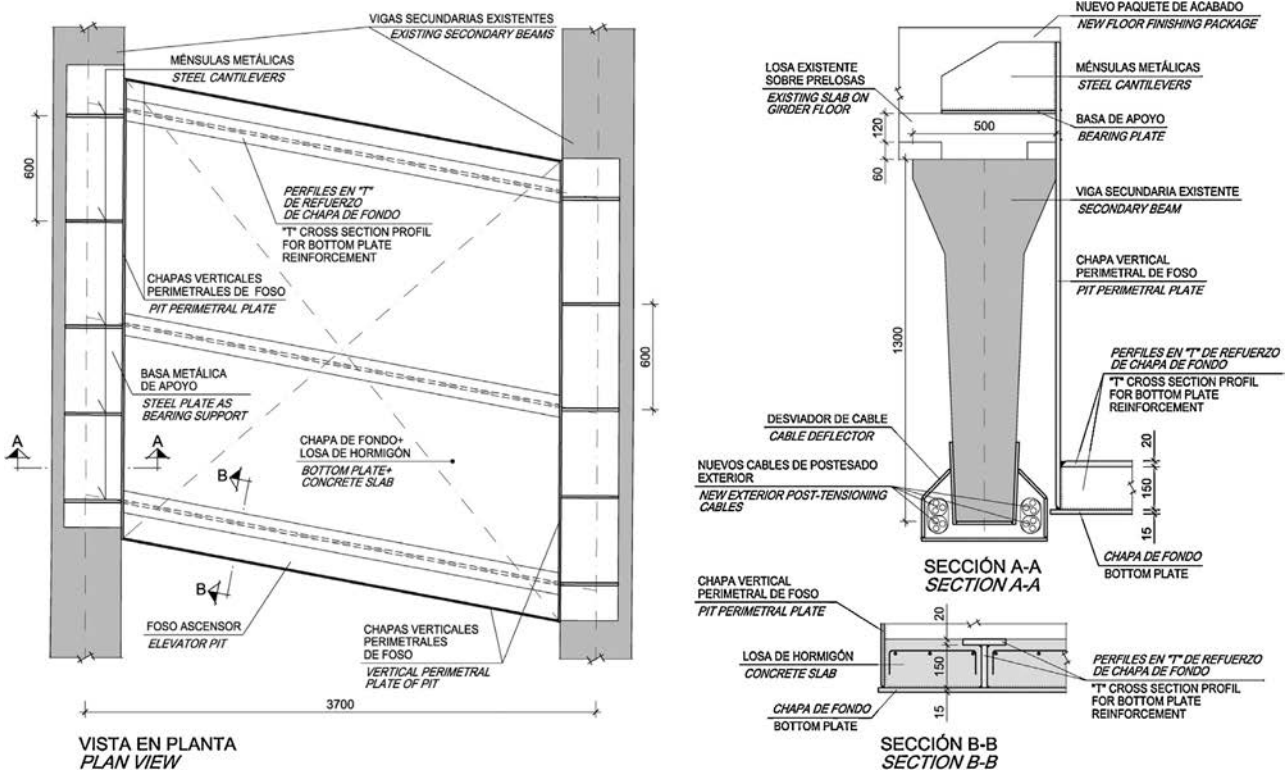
Steel enclosure for lift shaft (plan and cross-section).
